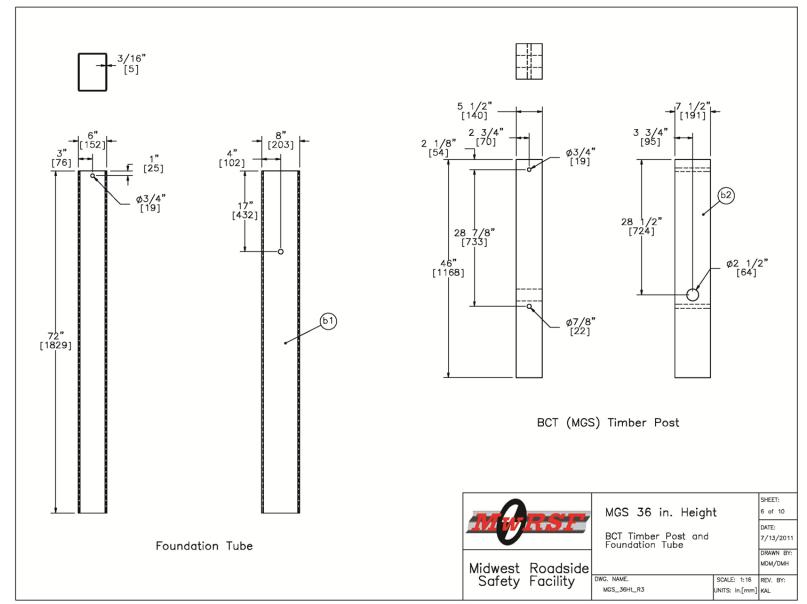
Anchor Post Details, Test No. MGSMRH-2
